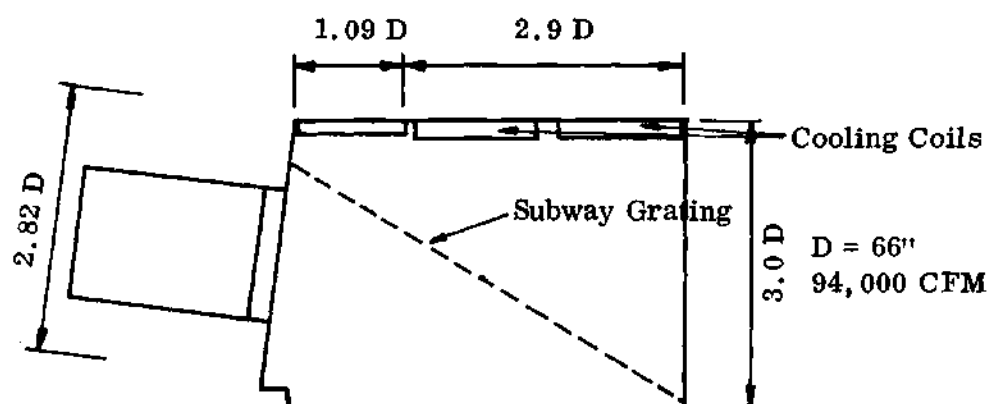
A Fan Room Arrangement Requiring Airflow to Turn
